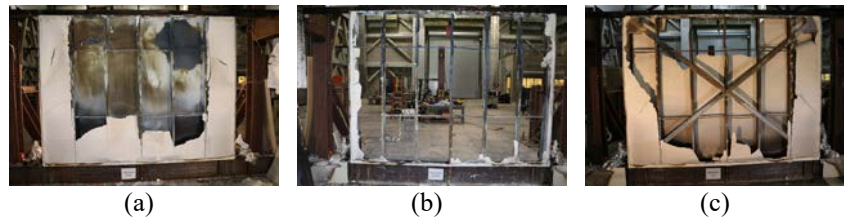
Fire-exposed side of wall after severe fire test: (a) gypsum-sheet steel composite panel sheathed wall; (b) Oriented Strand Board sheathed wall; (c) strap braced wall
